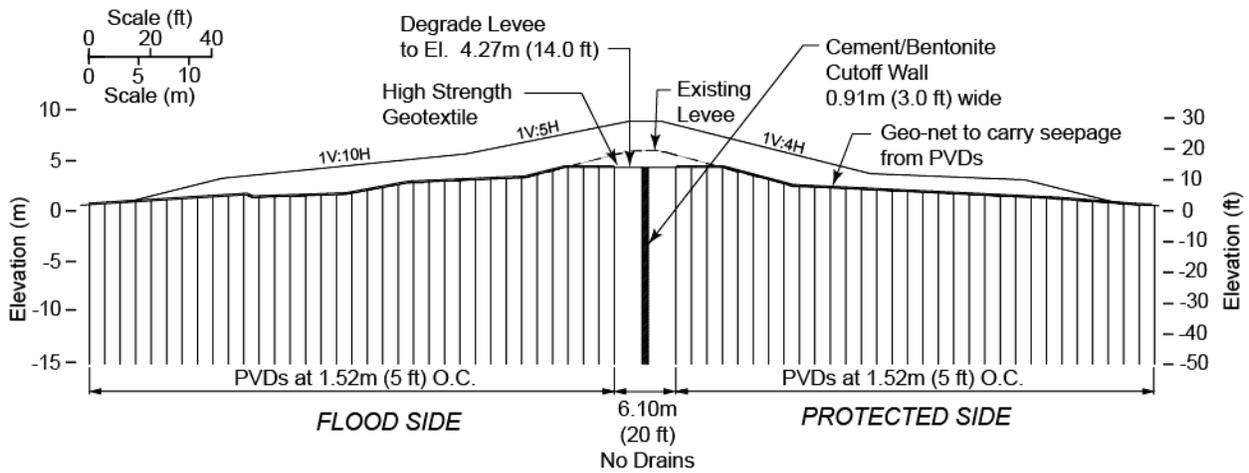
Typical LPV 111 levee profile for the Prefabricated Vertical Drain (PVD) design (adapted from URS Group, 2008).
